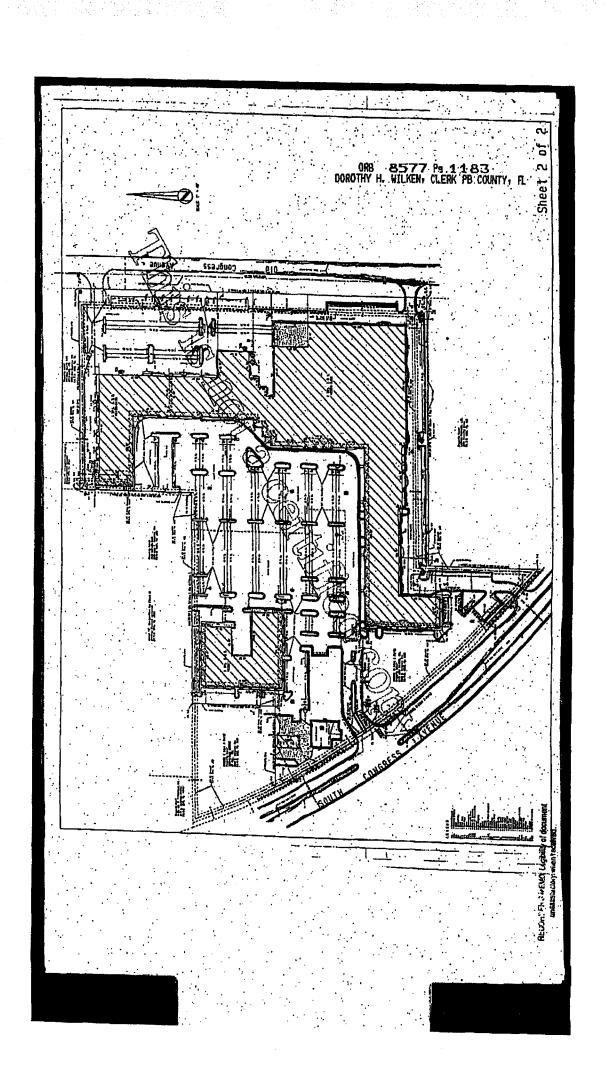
EXHIBIT "B" FLOOR PLAN OF "BUILDING"
